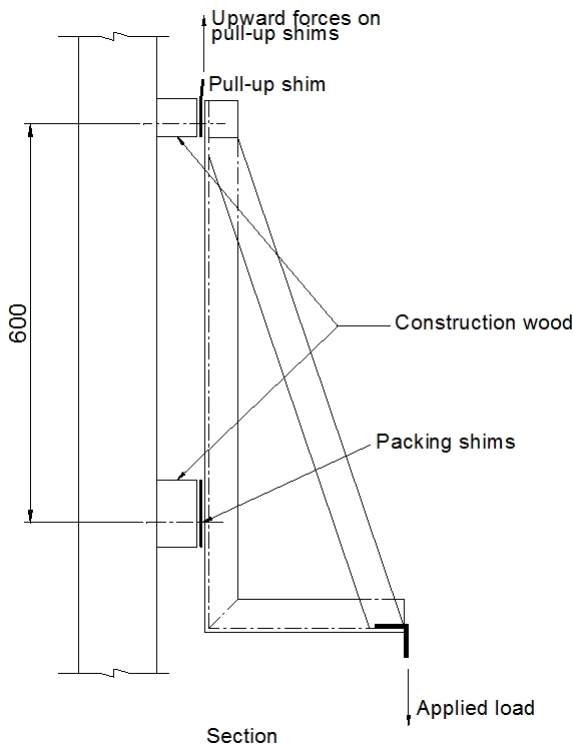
Heavyweight anchorage(high level wall cupboard) eccentric downward loading test
